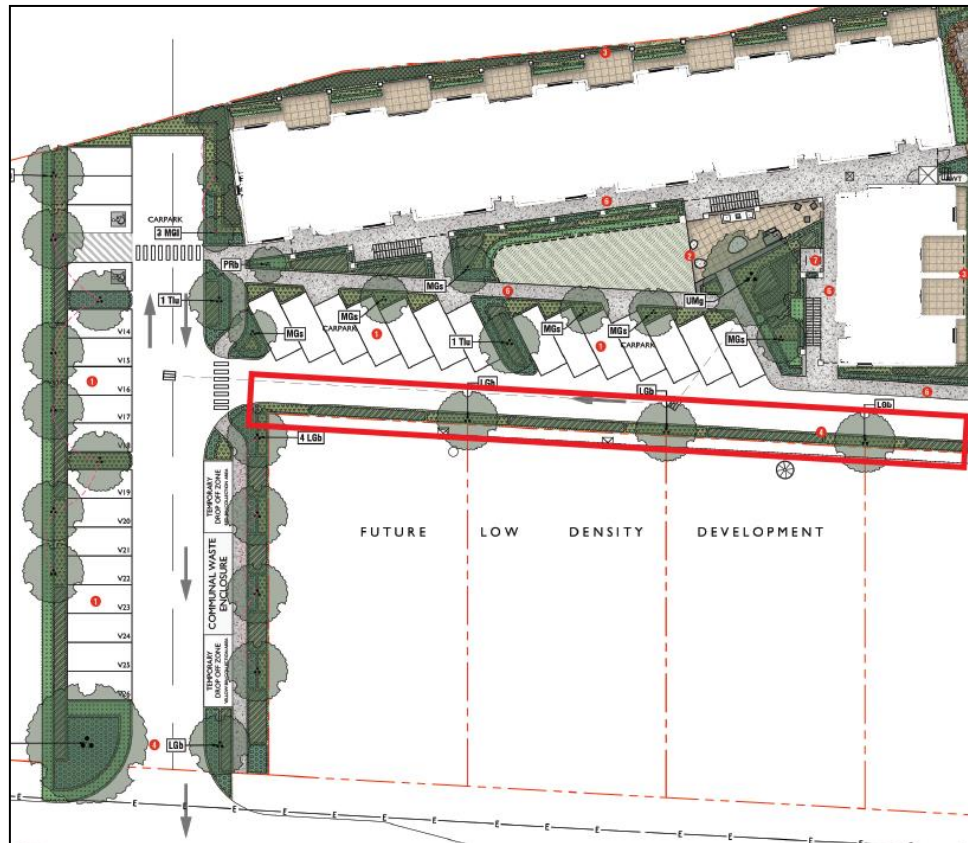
Excerpt of proposed Landscape Plan highlighting proposed 1m strip landscaping
